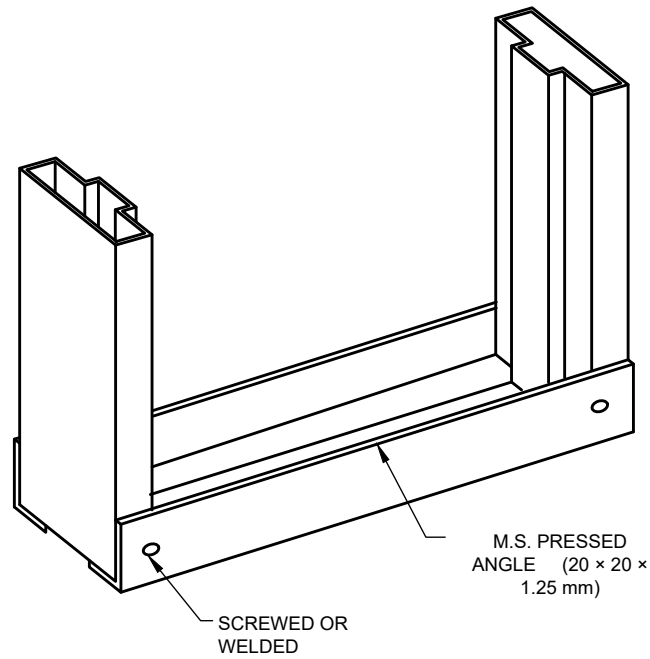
ARRANGEMENT AT BASE OF TUBULAR STEEL DOOR FRAMES
